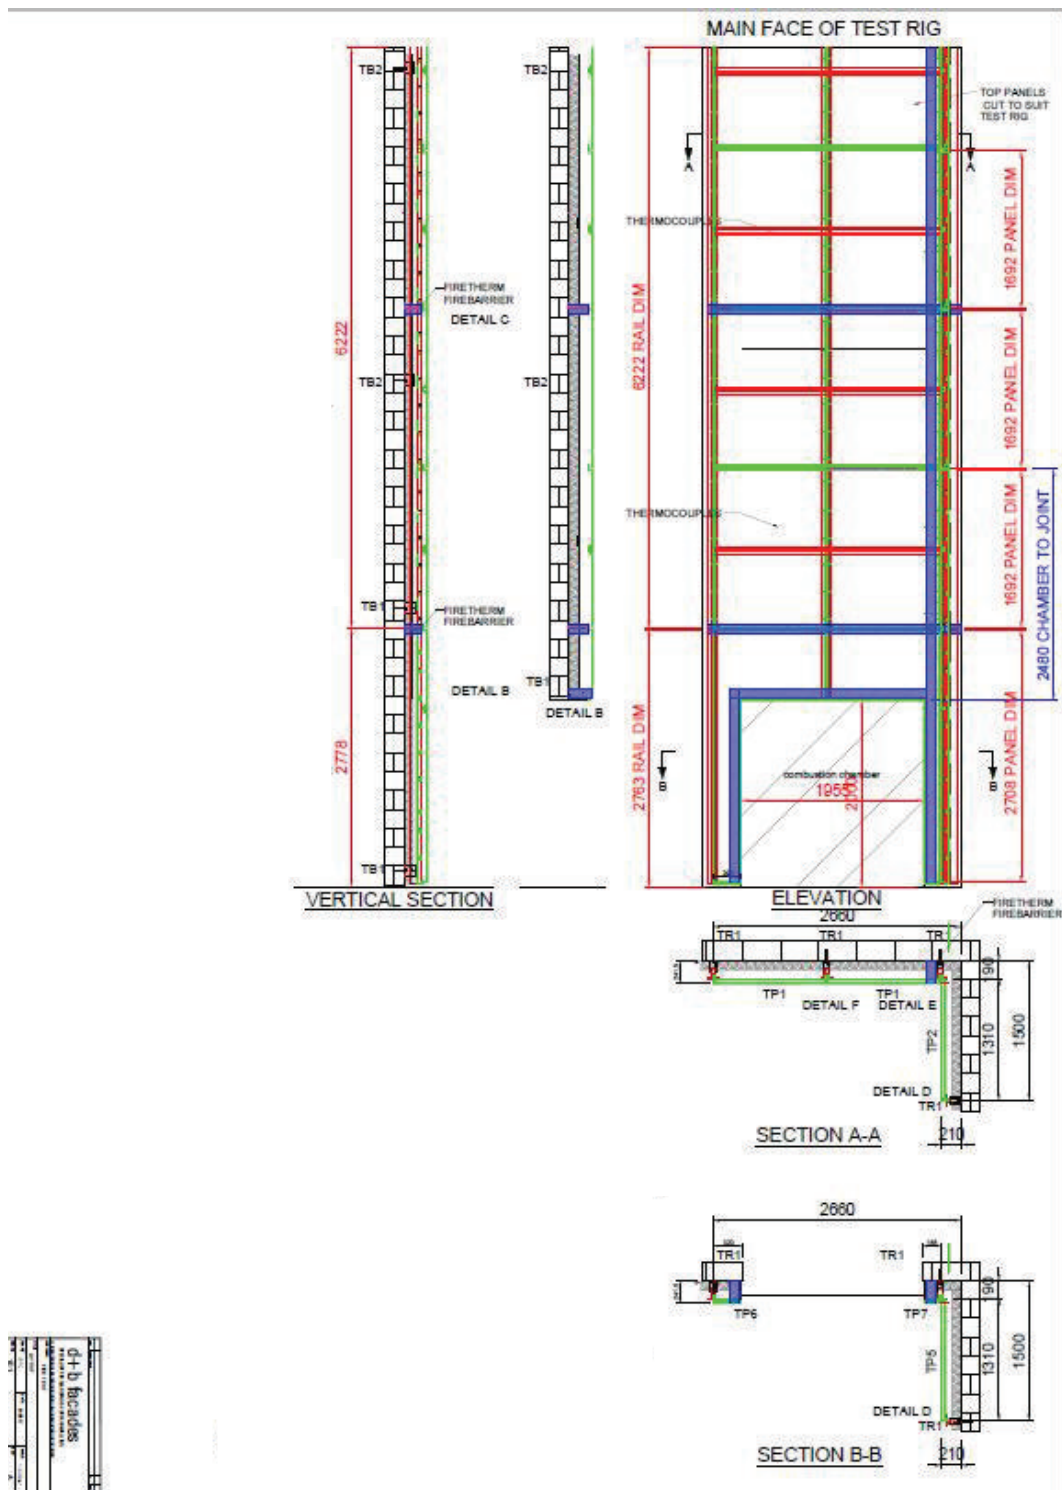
Drawing of tested system (supplied by the Test Sponsor).
